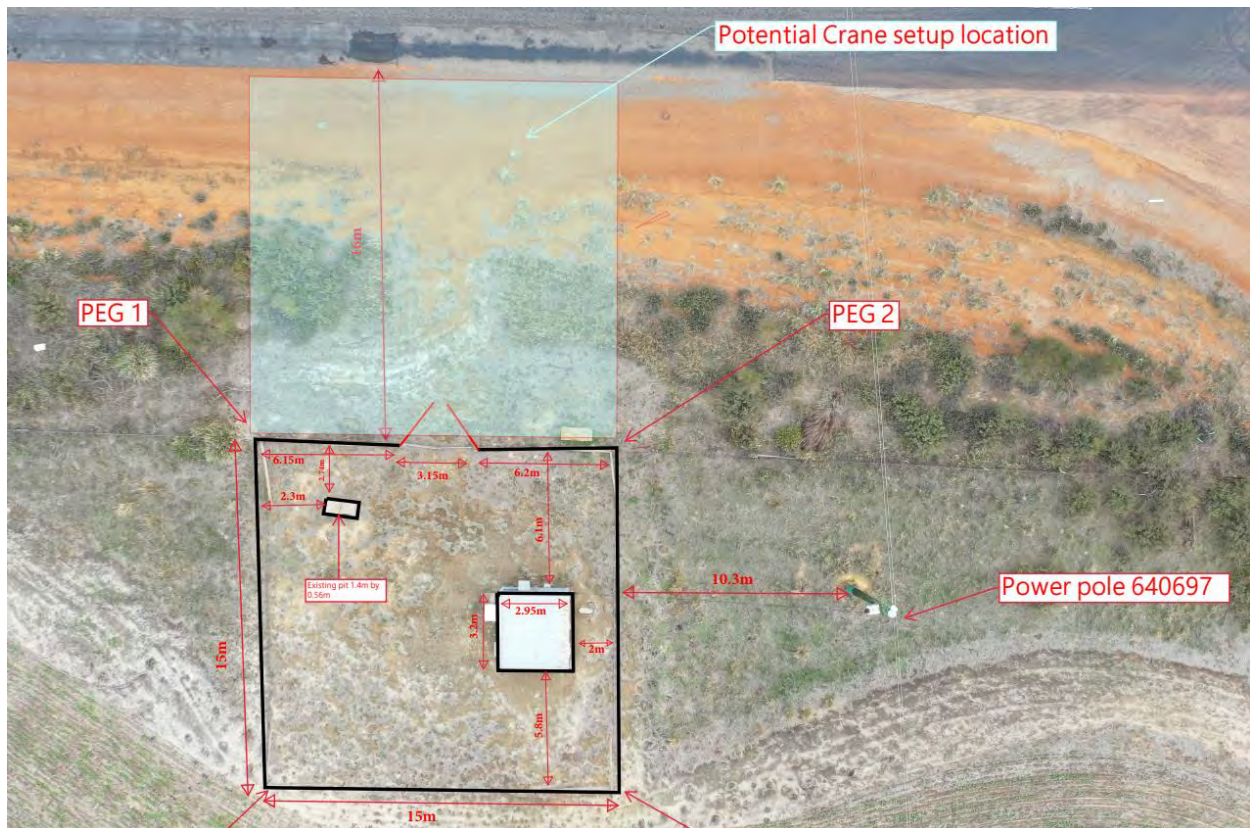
Existing and future access to subject site *Source: Nearmap 2024
